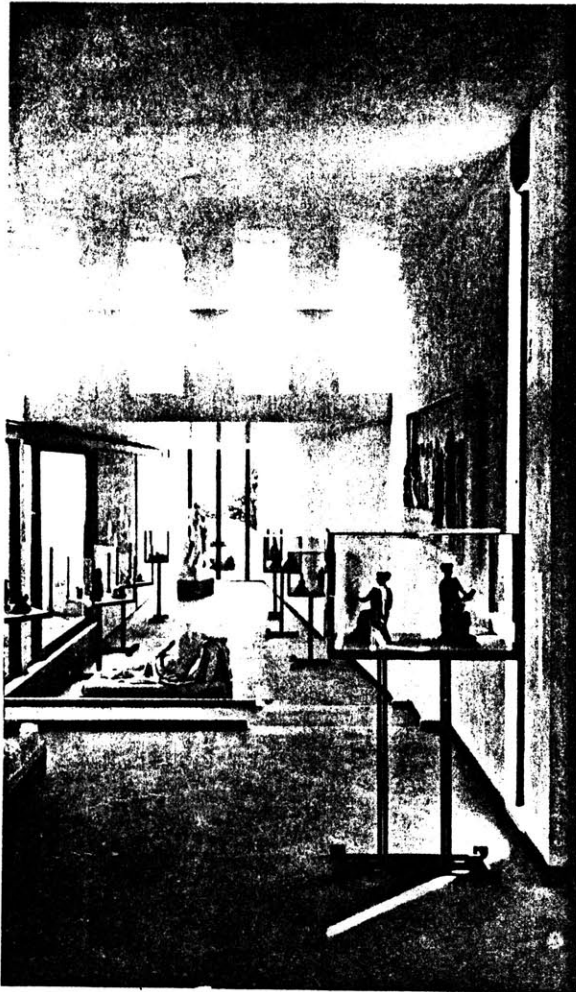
Opening running from floor to ceiling which marks the meeting of the south wall of the double height gallery space and the west wall appears on the right. Roof level change is marked by a series of openings.
